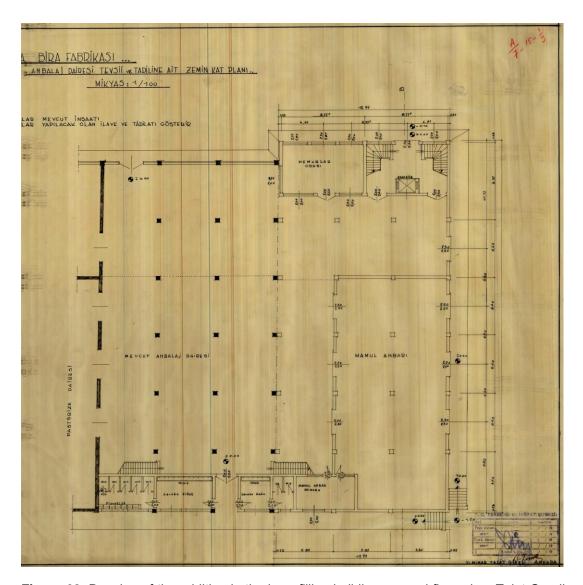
Drawing of the addition in the beer filling building, ground floor plan, Talat Güreli, master architect worked in the Construction Section in General Directorate of TEKEL (Source: TTA Archive)
